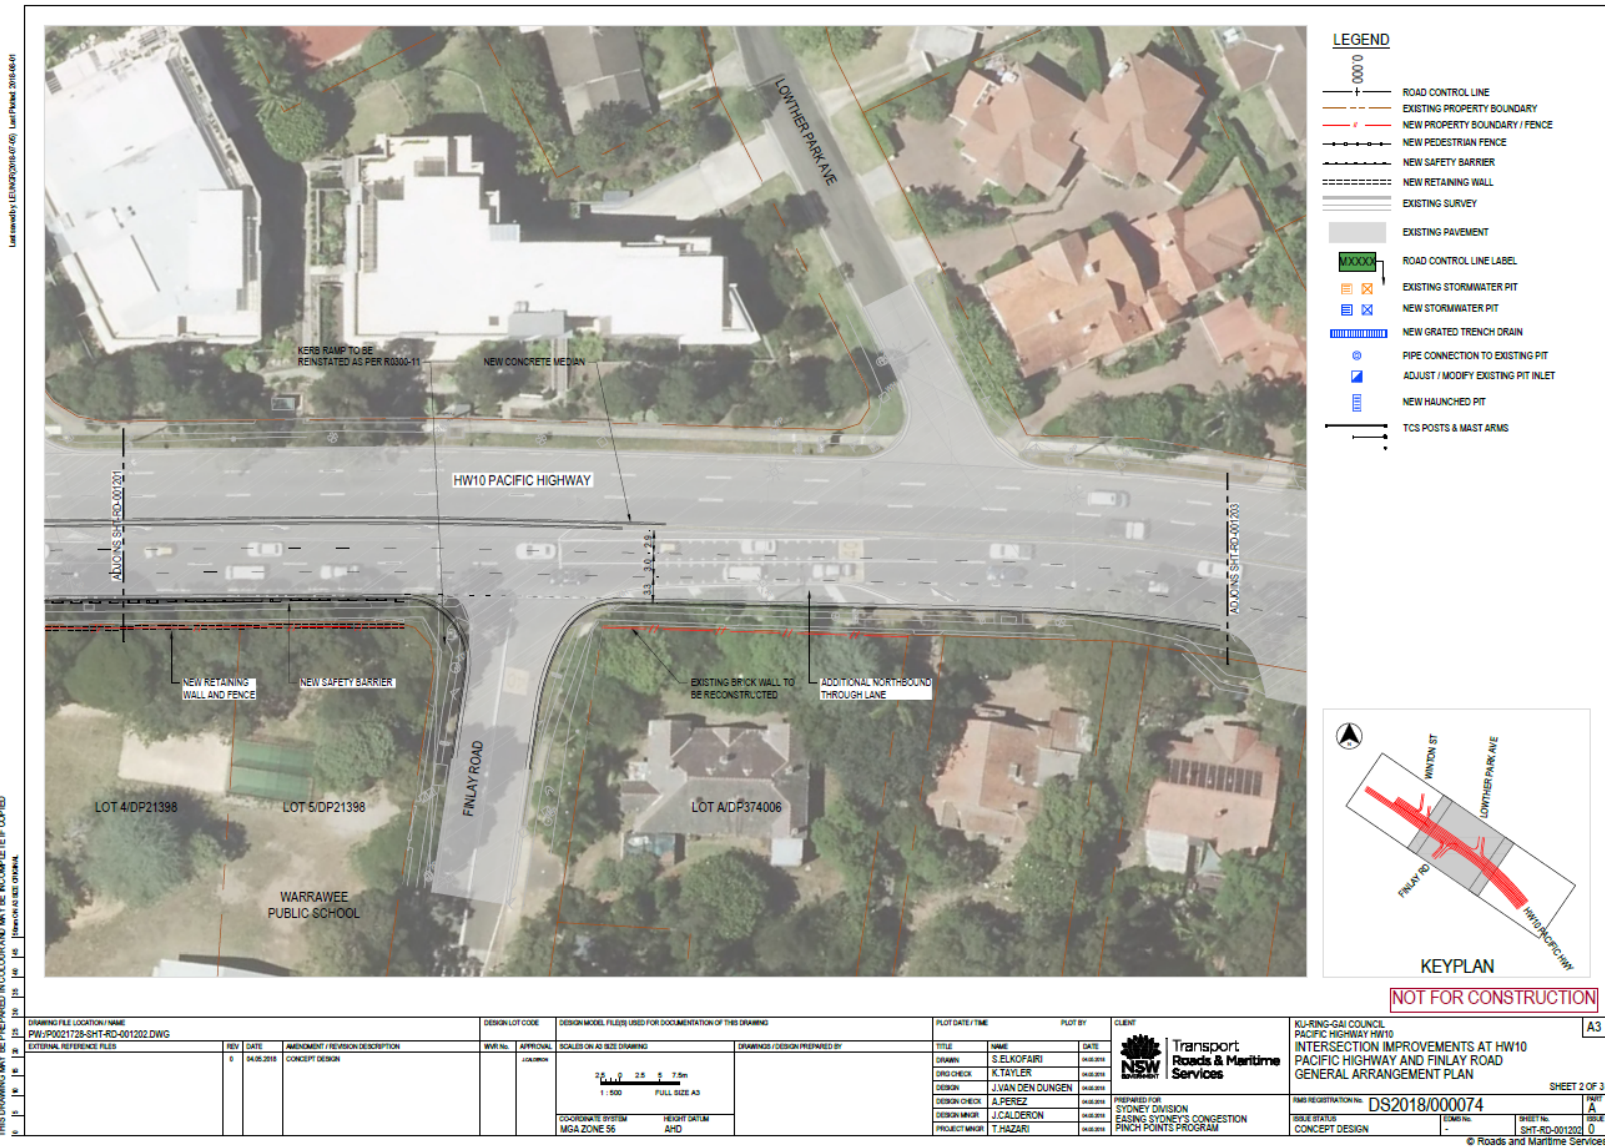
The proposal design – Intersection 1 (Pacific Highway at Finlay Road, Warrabee/Turrumurra) – Sheet 2 of 3
